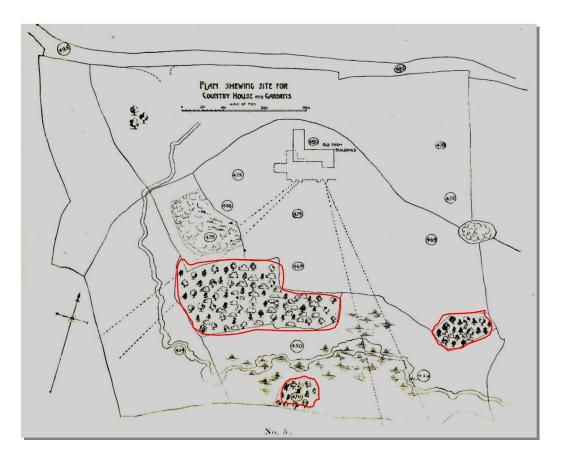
'Plan Shewing Site for Country House and Gardens' by Thomas Mawson, depicting the positioning of plantations (delineated in red) to provide shelter to the house.
